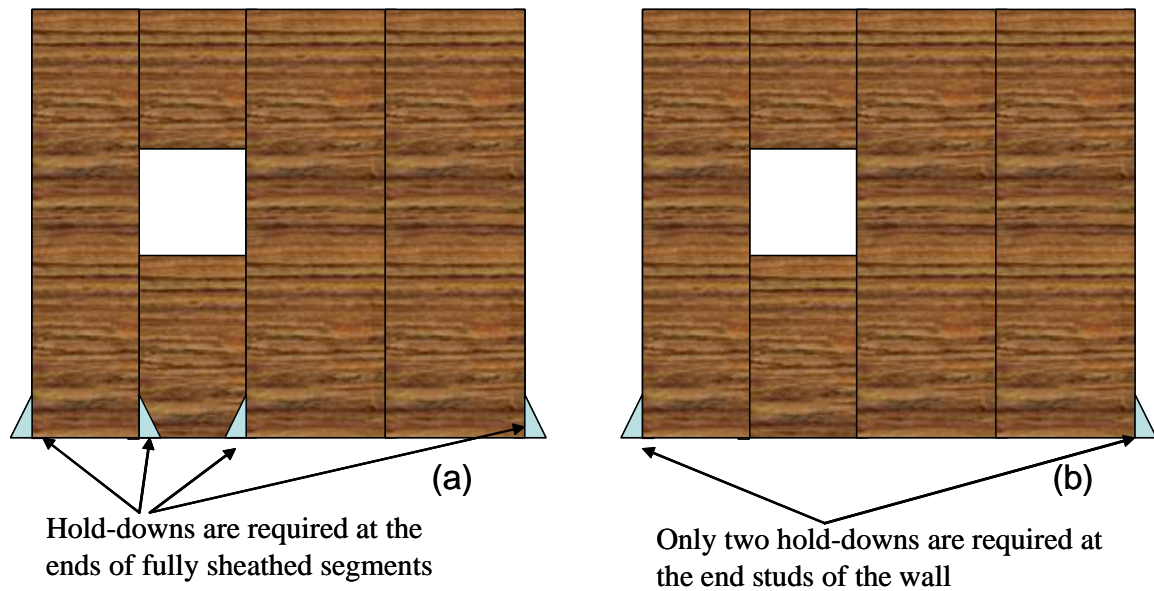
(a) A segmented shear wall. (b) A perforated shear wall.
